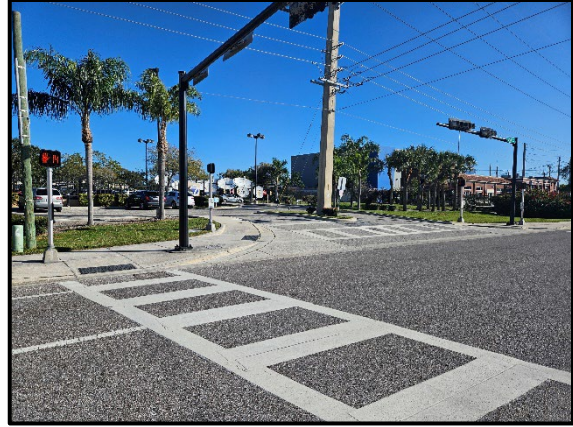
Various utilities on southwest corner of Central Avenue/10<sup>th</sup> Street intersection, facing northwest.
